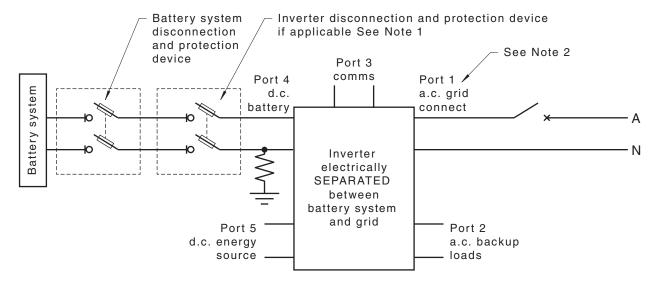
Example BESS installation diagram: battery connected to an inverter providing separation from the grid with a direct earth connection
